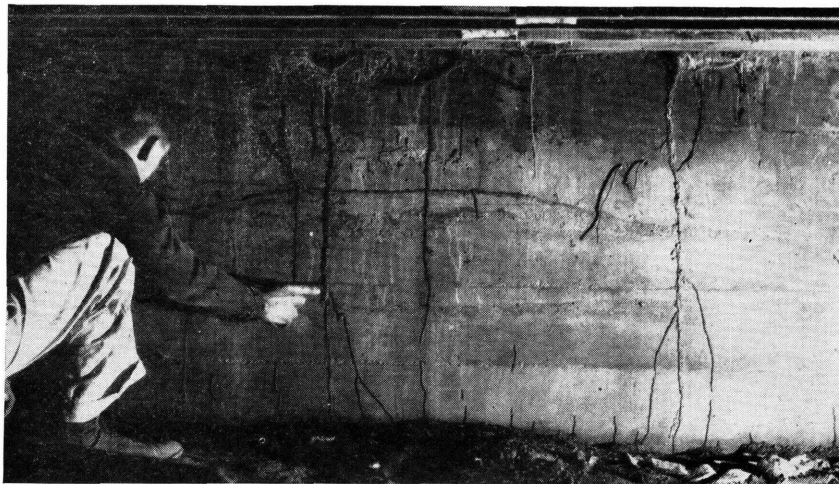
Shelter tubes made by termites over concrete foundation wall in poorly ventilated basementless area beneath a building. Many tubes are being extended downward from the damaged sill to the ground to reach moisture.
